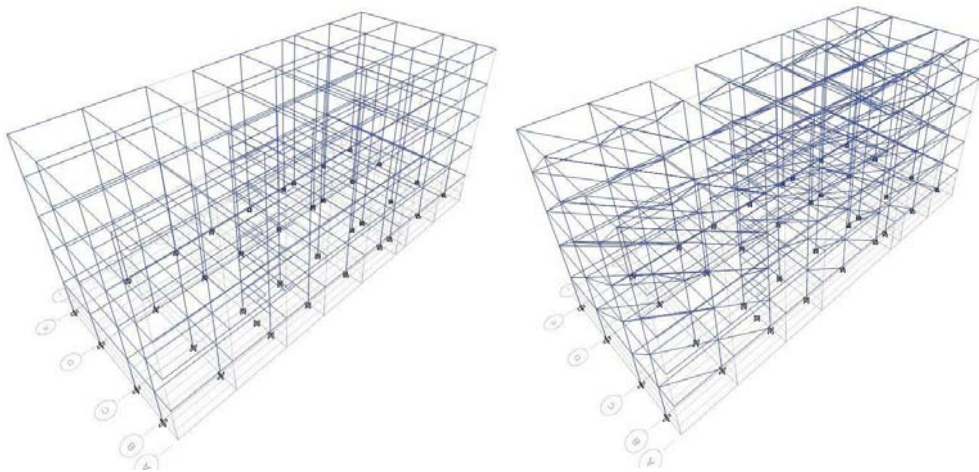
Bare frame & Soft Storey 3D view with strutsBuilding 2
